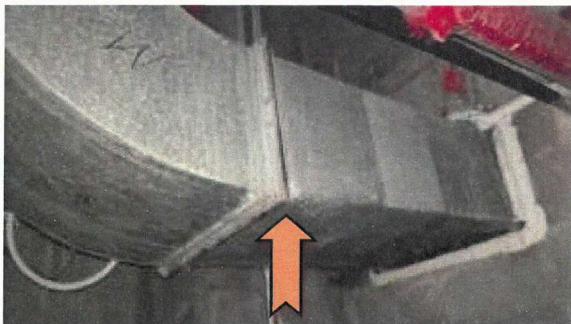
Basement 2 – Car park – Air conditioning riser adjacent diesel storage tank – Asbestos-containing mastic on flanges. Sample 22505-001-003
